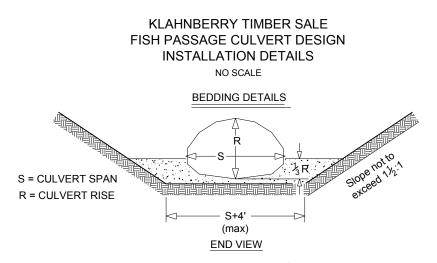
### EXHIBIT "E" KLAHNBERRY TIMBER SALE FISH PASSAGE CULVERT DESIGN A to B - Station 120+30
